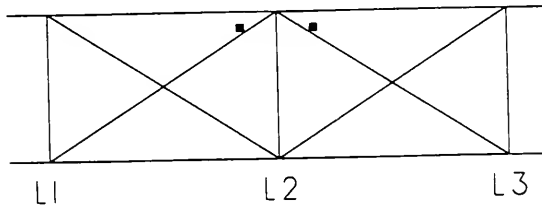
Location of Measurement Points for the North and South Trusses
